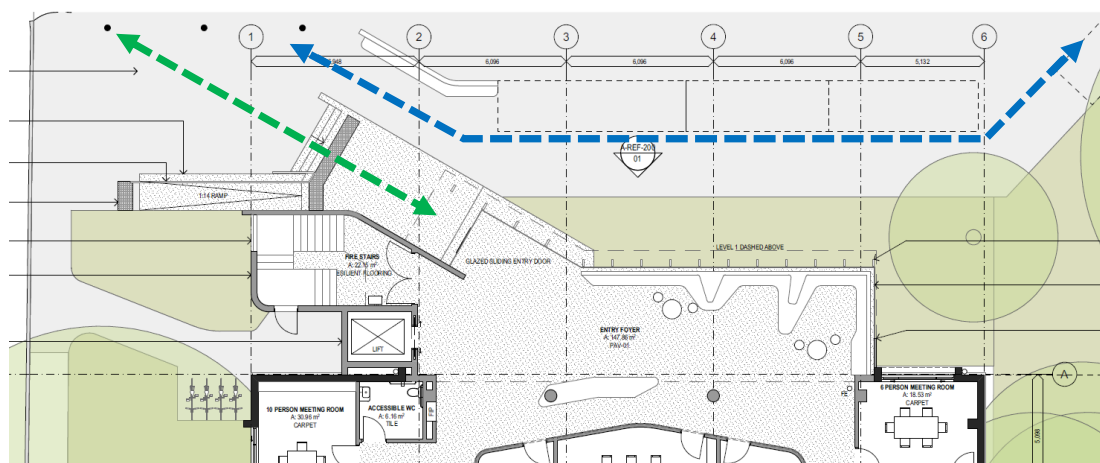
Proposed ground floor plan showcasing the northern extension and new forecourt. The proposed design separates the pedestrian (green) and vehicular (blue) access. Source: Lahznimmo with Curio additions, 2021.
